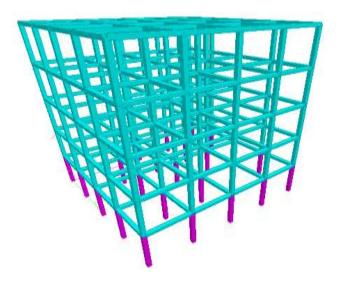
FRP INSTALLED AT GROUND FLOOR COLUMNS.
